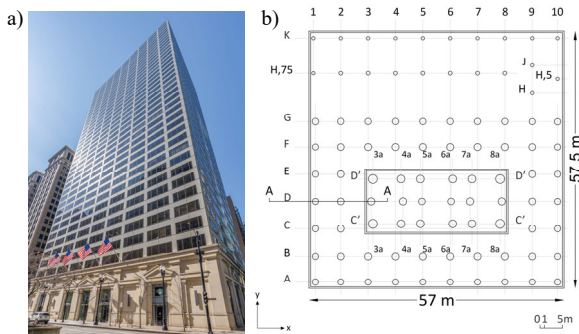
a) Chicago North La Salle office building; b) plan view of the foundations system.
